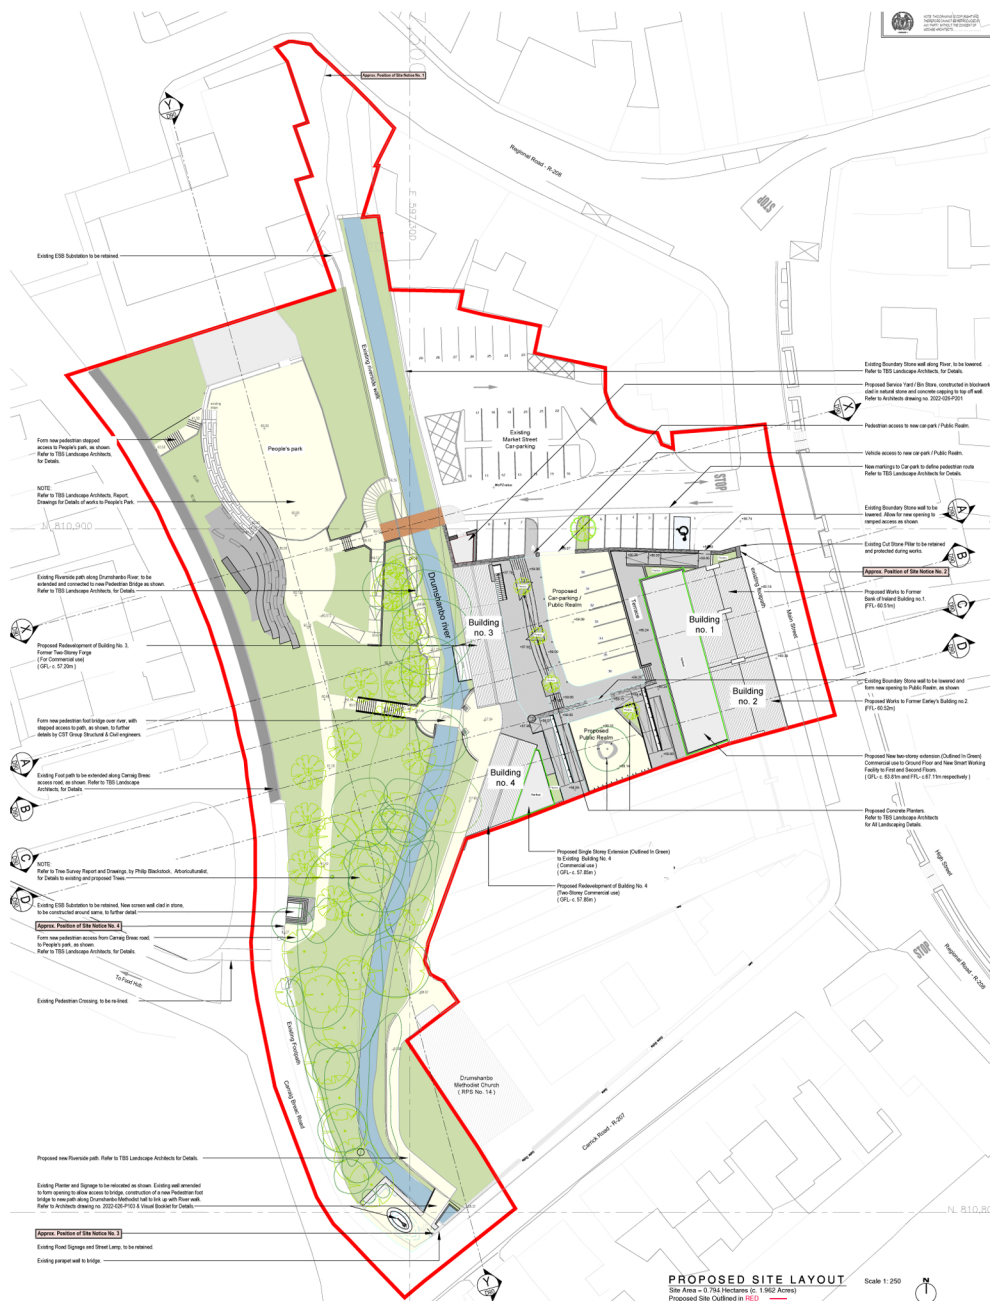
Red-line boundary plan of the Drumshanbo site [McCabe Architects
